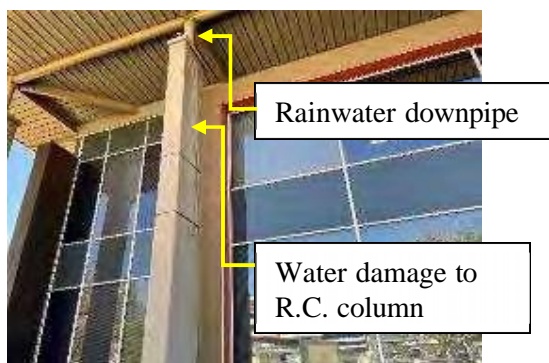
Showing the rainwater downpipe cast into R.C. column and water damage to the concrete column
